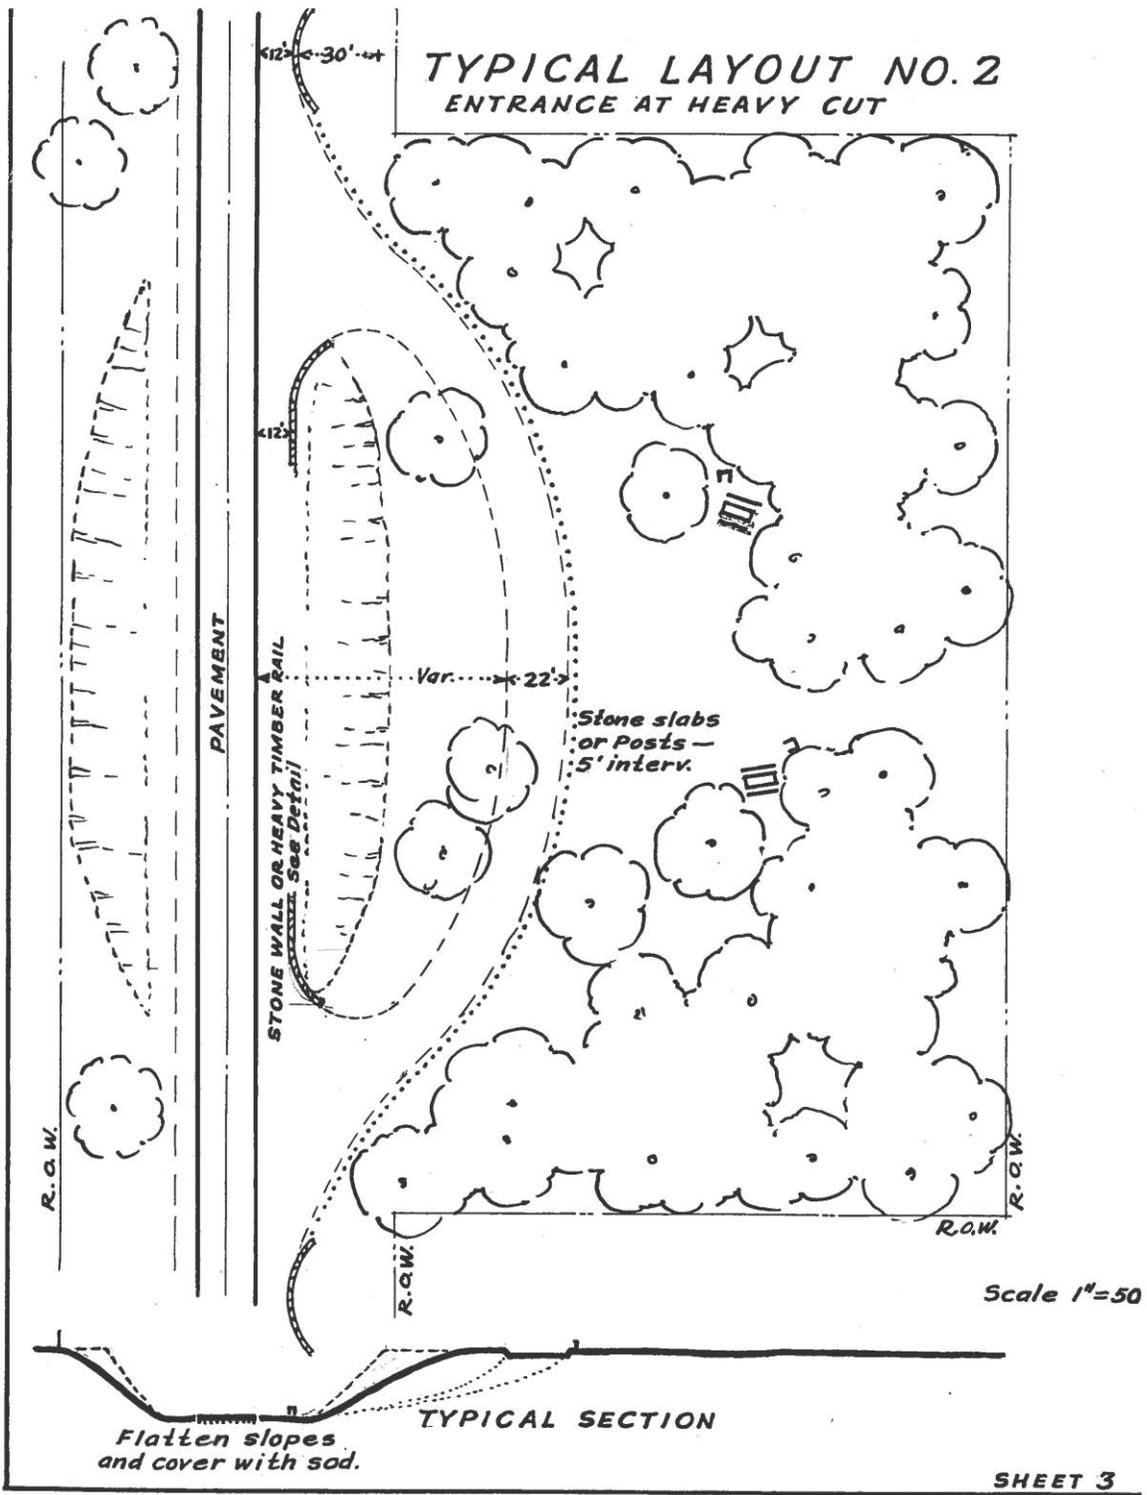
Typical roadside park layout no. 2 designed by Gubbels (1936).
